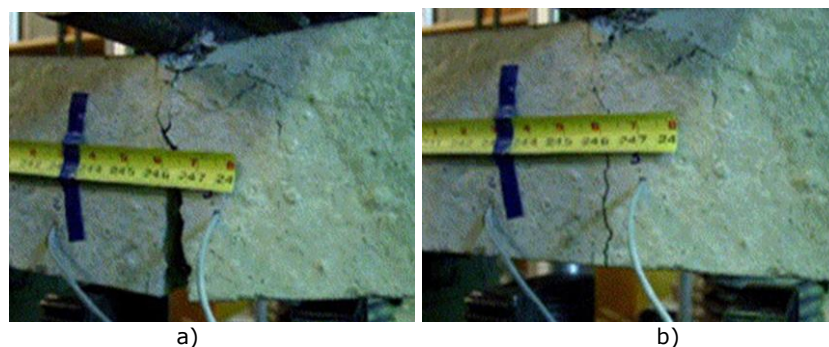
A large crack during a loading test. The crack closes after the loading test [25]
